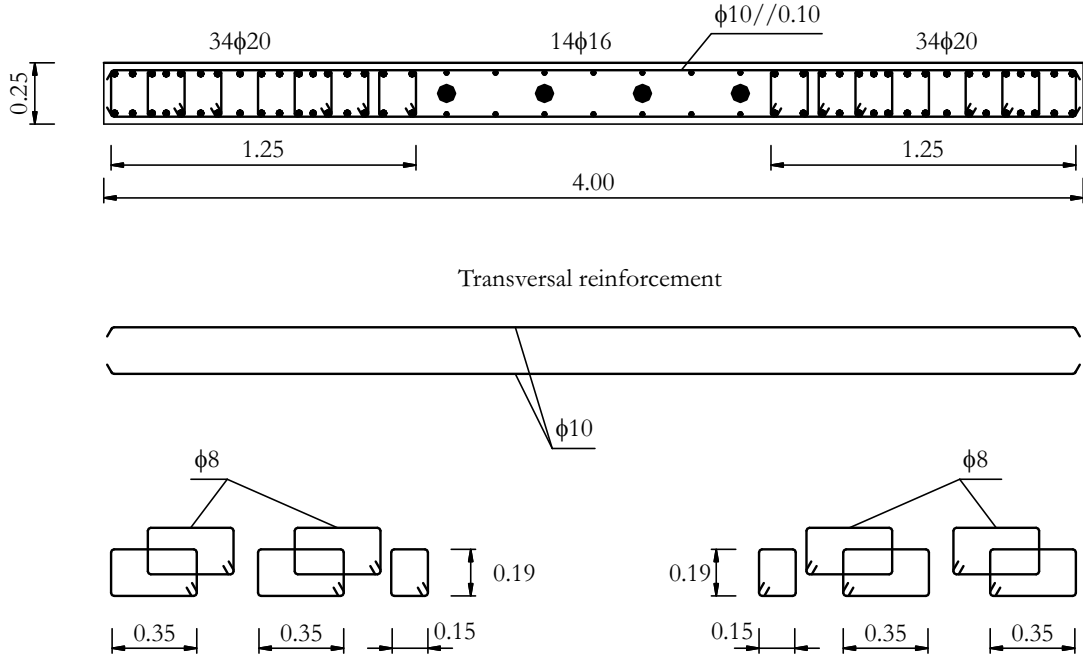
Wall section detailing above the base section for the hybrid system.
